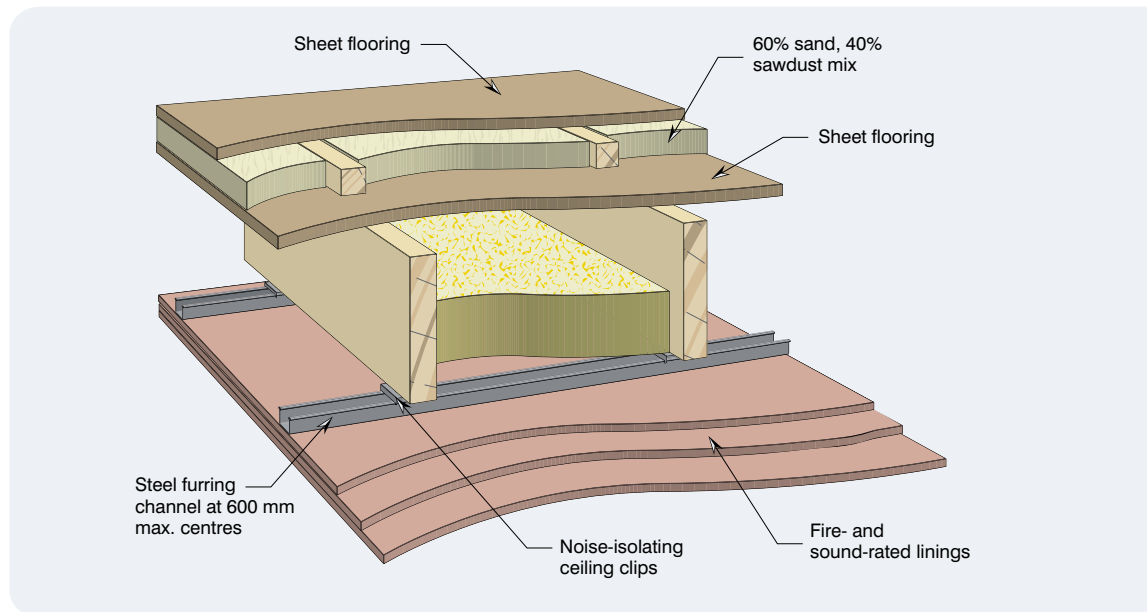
Adding mass to floor system through the use of sand top layer.
